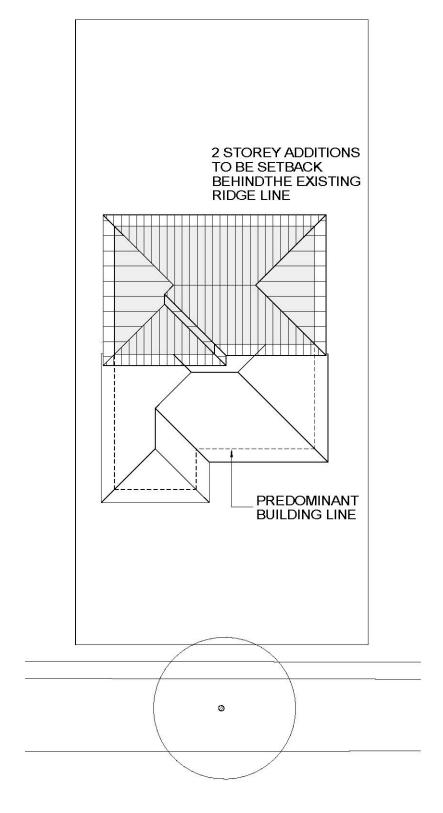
Plan Showing Second Storey Addition to Traditional House
